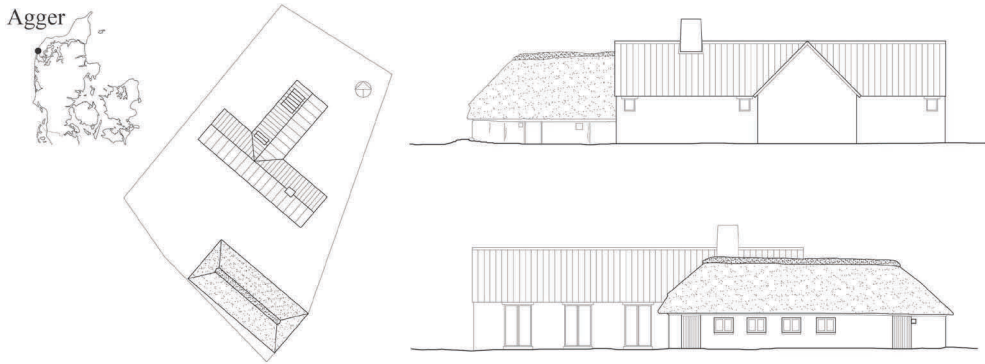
The Hahn Lavsén house. The houses are orientated according to the strong, prevalent wind from the north-west. North and south elevations. Scale and fenestration of the new house aligns with the old house. Drawings are based on (Thisted Kommune, 2025) (Eybye, 2025).
